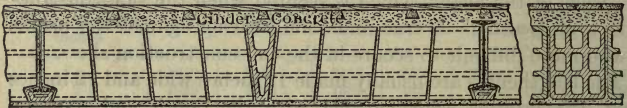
Deep End-construction Arch with Side-construction Key.
